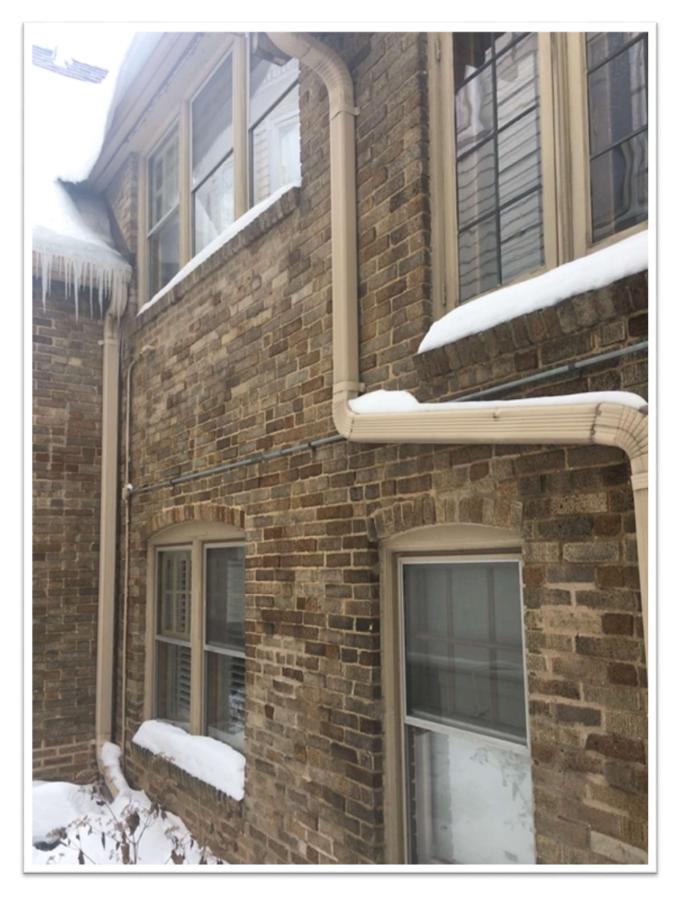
Some of storm/screen combinations to be replaced on north and east elevations.
